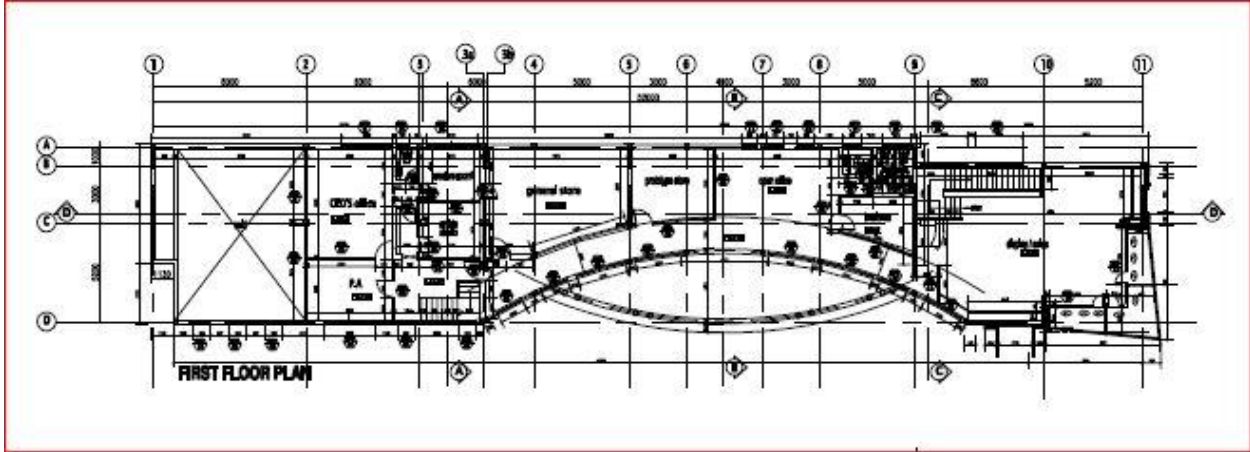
Figure Showing the First-Floor Plan House of Adeola
